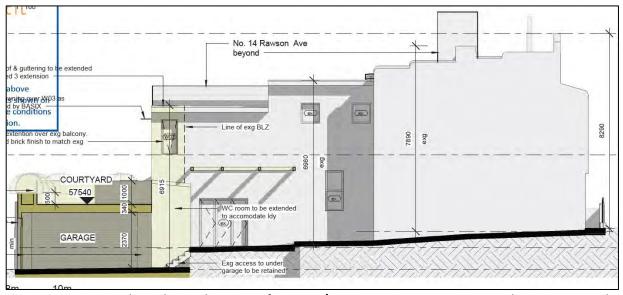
Approved northern elevation of DA-160/2020 at 12 Rawson Avenue demonstrating the enclosure of the rear balcony and new window.
